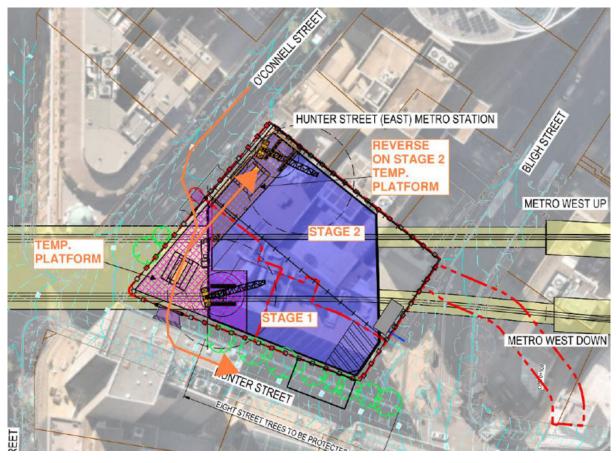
Site Plan of Hunter Street East Construction Site - Stage 2 Excavation
